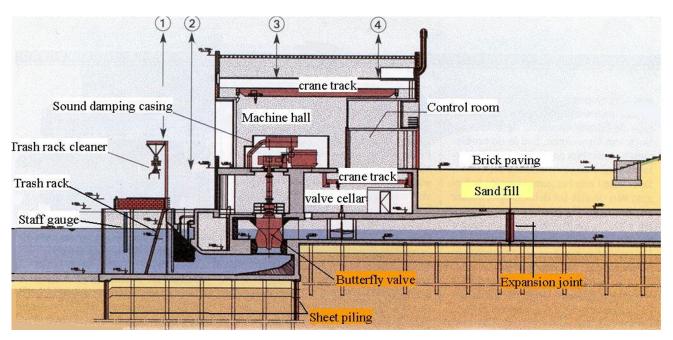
Cross-section pumping station Rozema and culvert through the dike
